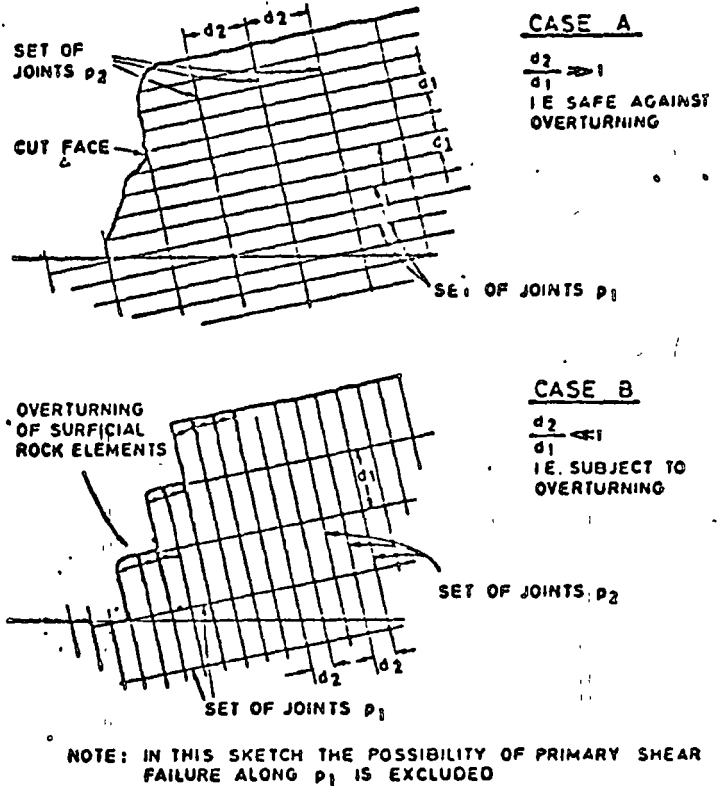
Joint spacing governing secondary failure of slope surface by overturning of rock elements
